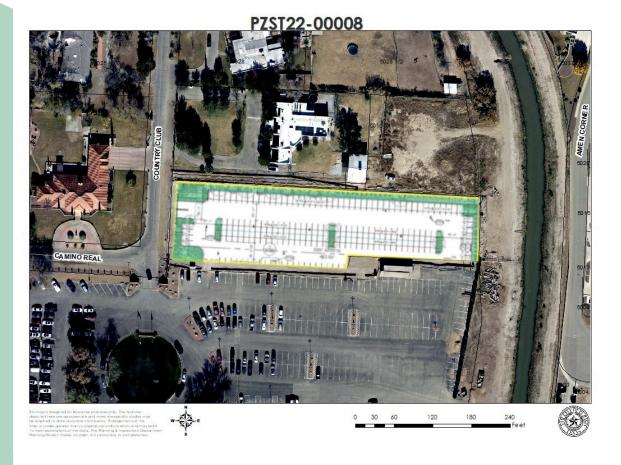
Figure A. Detailed Site Development Plan Superimposed on Aerial Imagery
